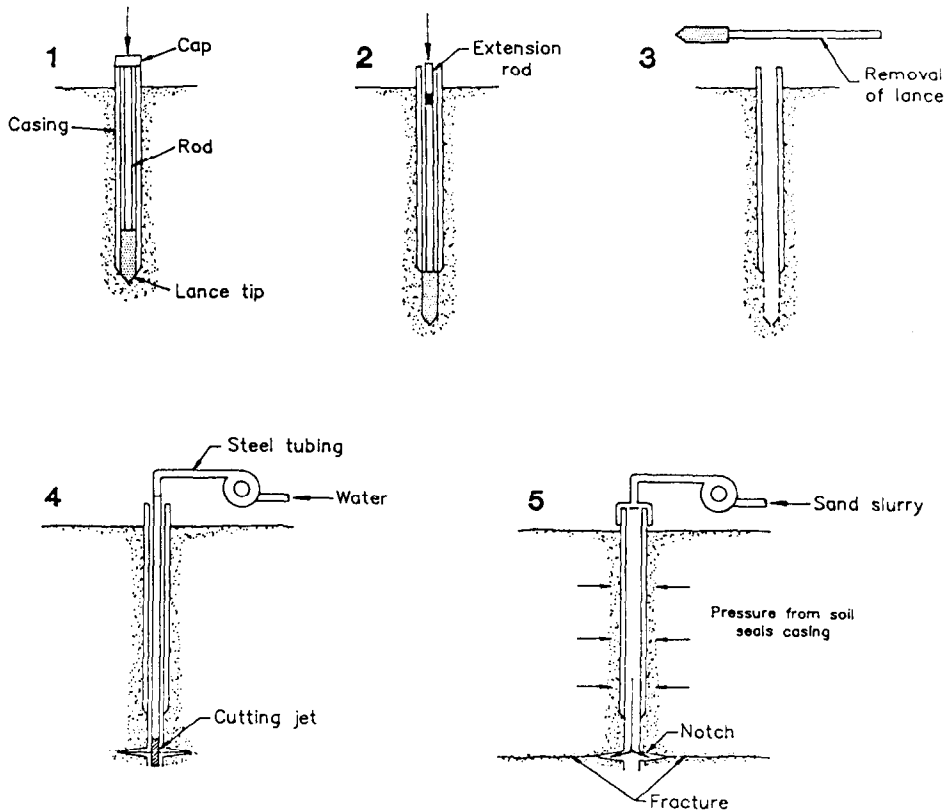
Schematic of hydraulic fracturing process inside a well borehole.
